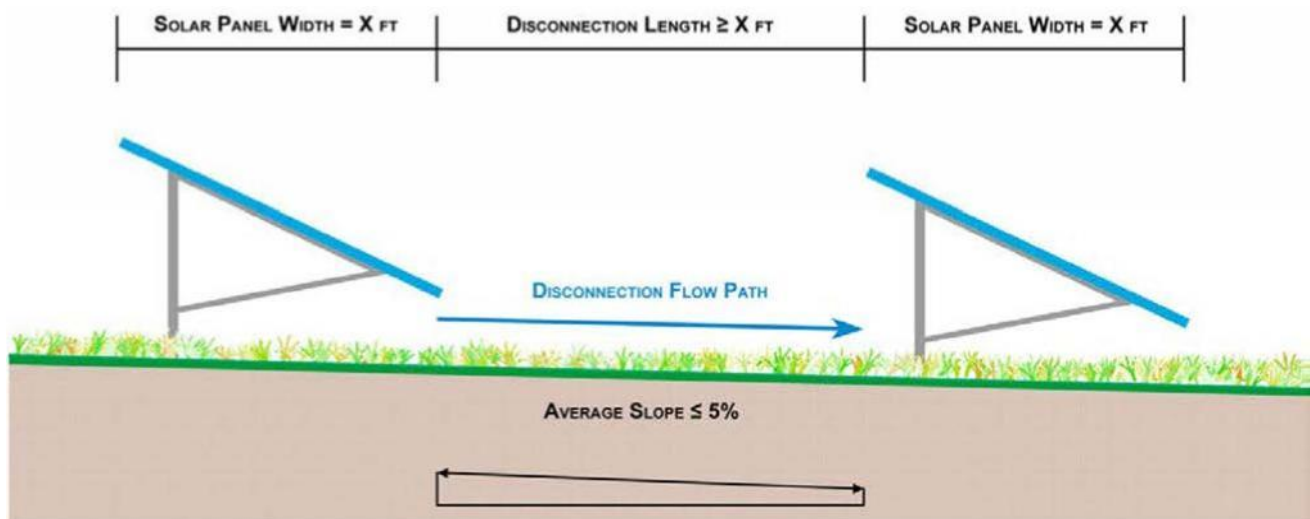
Typical Solar Panel Installation with Slopes $\leq 5\%$
